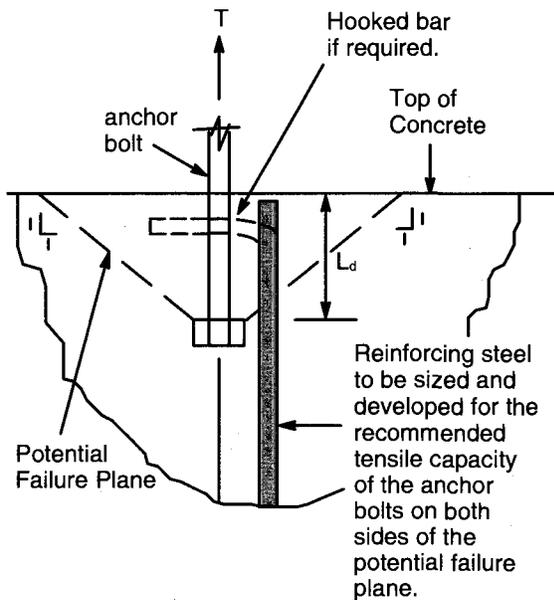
The Use of Steel Reinforcement for Developing Anchor Bolts
